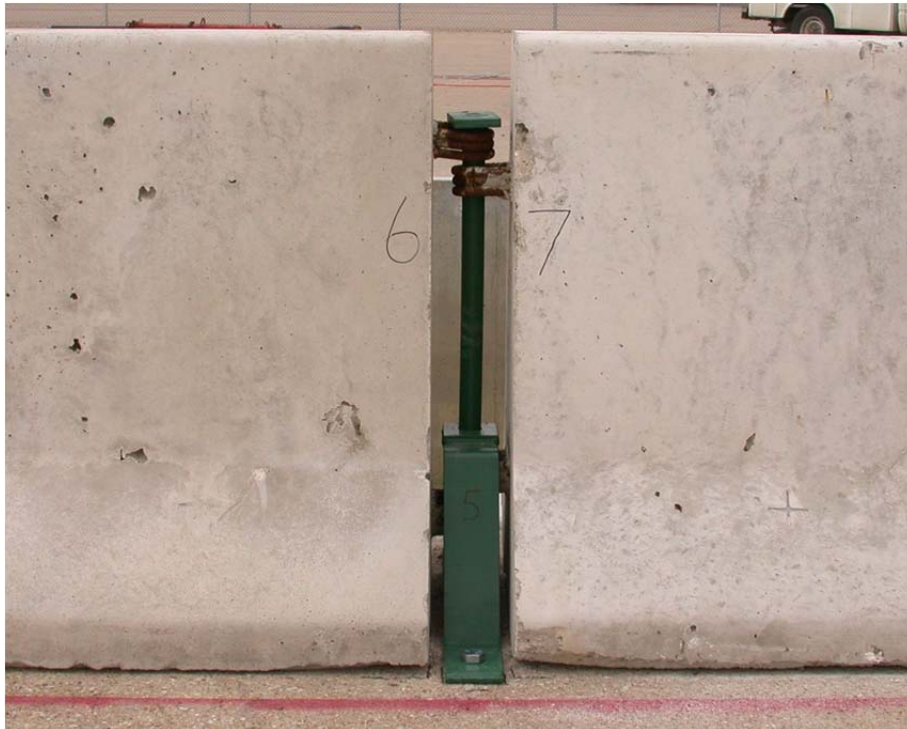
Temporary Concrete Barrier Steel Strap Tie-Down
